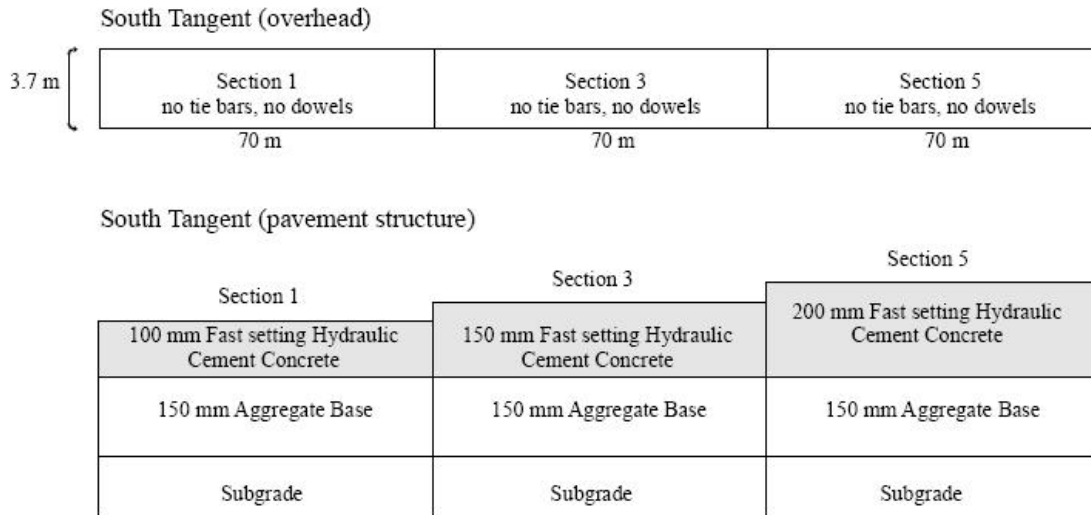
South Tangent layout and pavement structure diagram (from Roesler et al., 2000).
